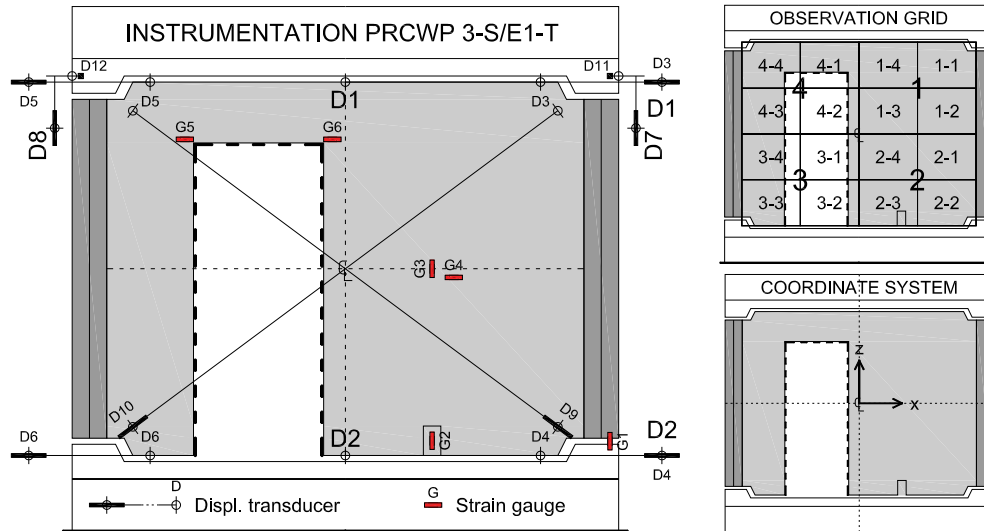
Instrumentation layout of specimen PRCWP 3-S/E1-T
